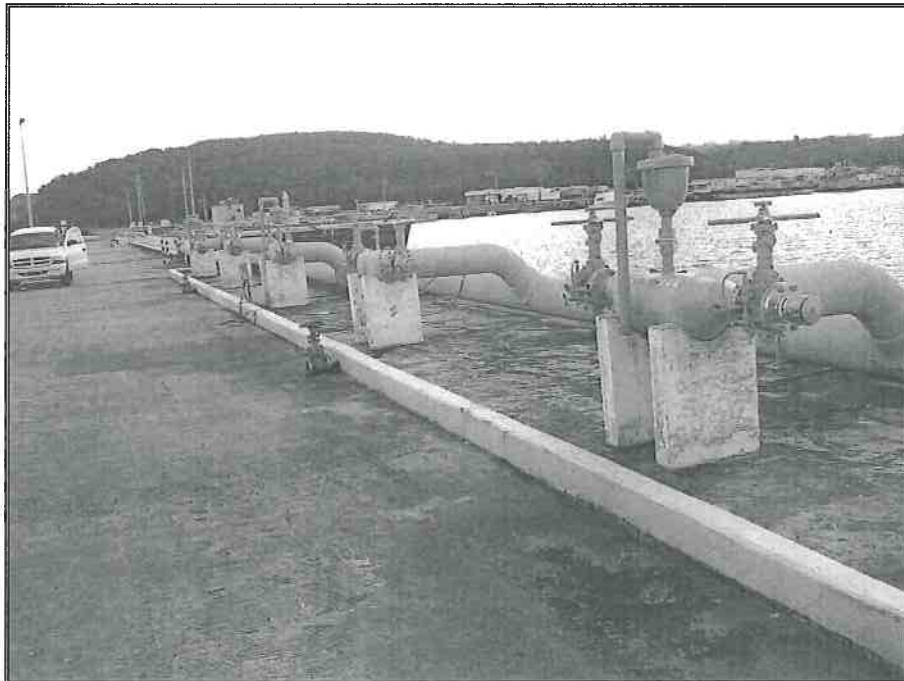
D – Pier 1 Barge Risers JP-5, DFM and DFM-S Pipelines
